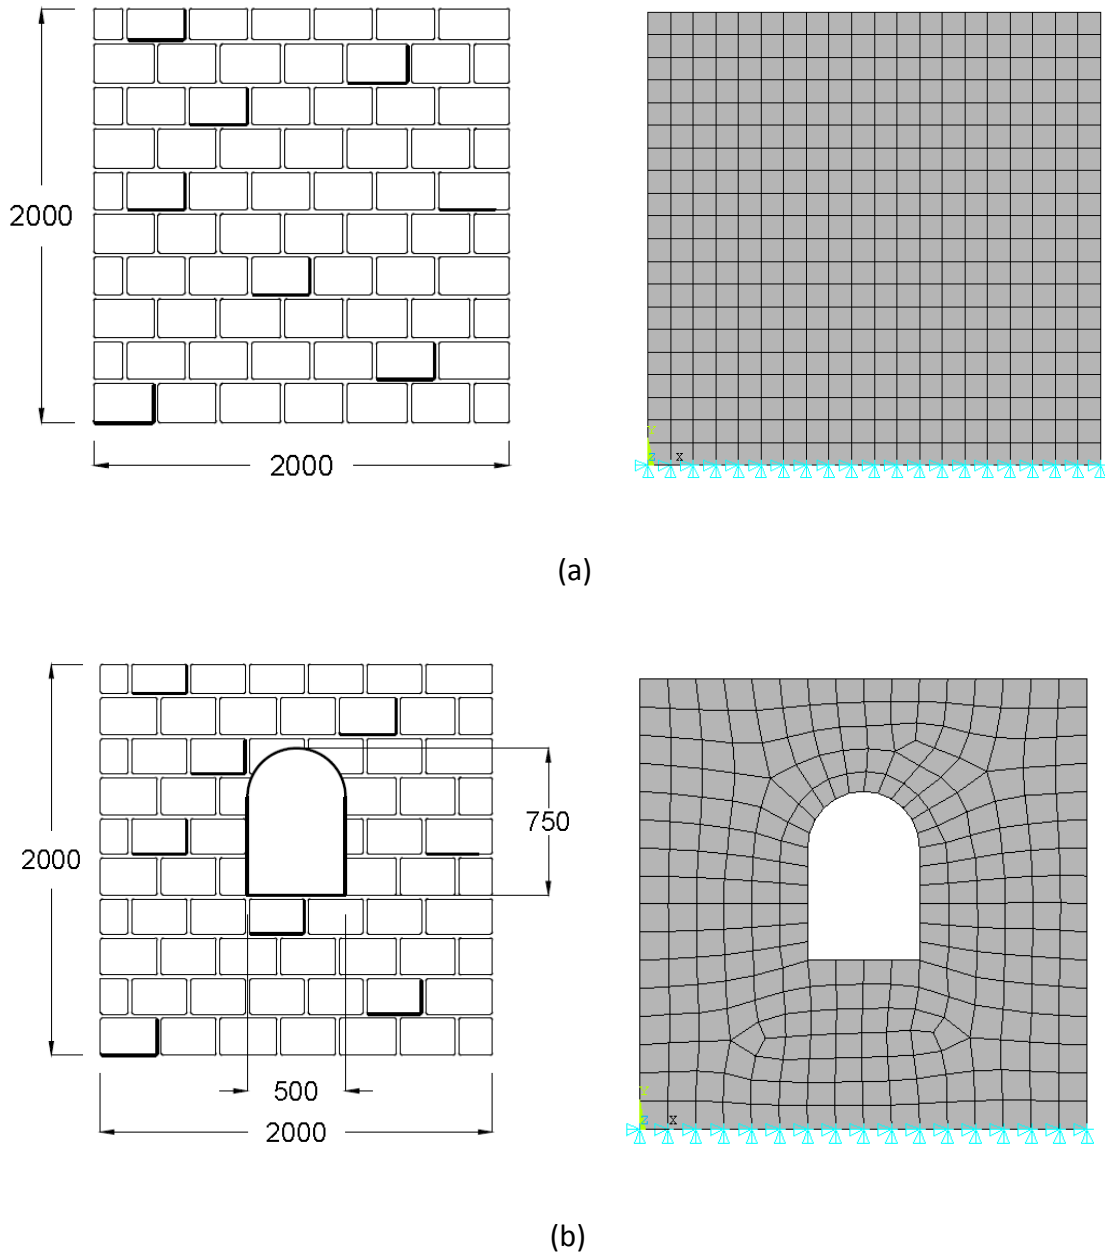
Dimensions (mm) and FE models of walls representative of old masonry structures; (a) simple wall and (b) wall with central opening
